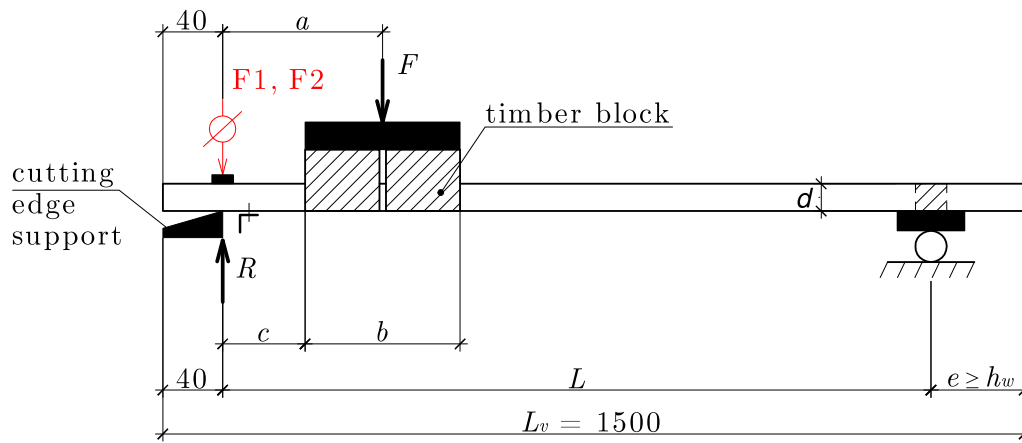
Test setup for end support tests and shear tests. Dimensions in [mm].
